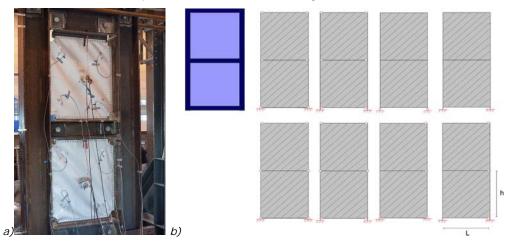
a) SSW tested in the laboratory of RWTH Aachen University, b) scheme of possible connections to existing structure.
